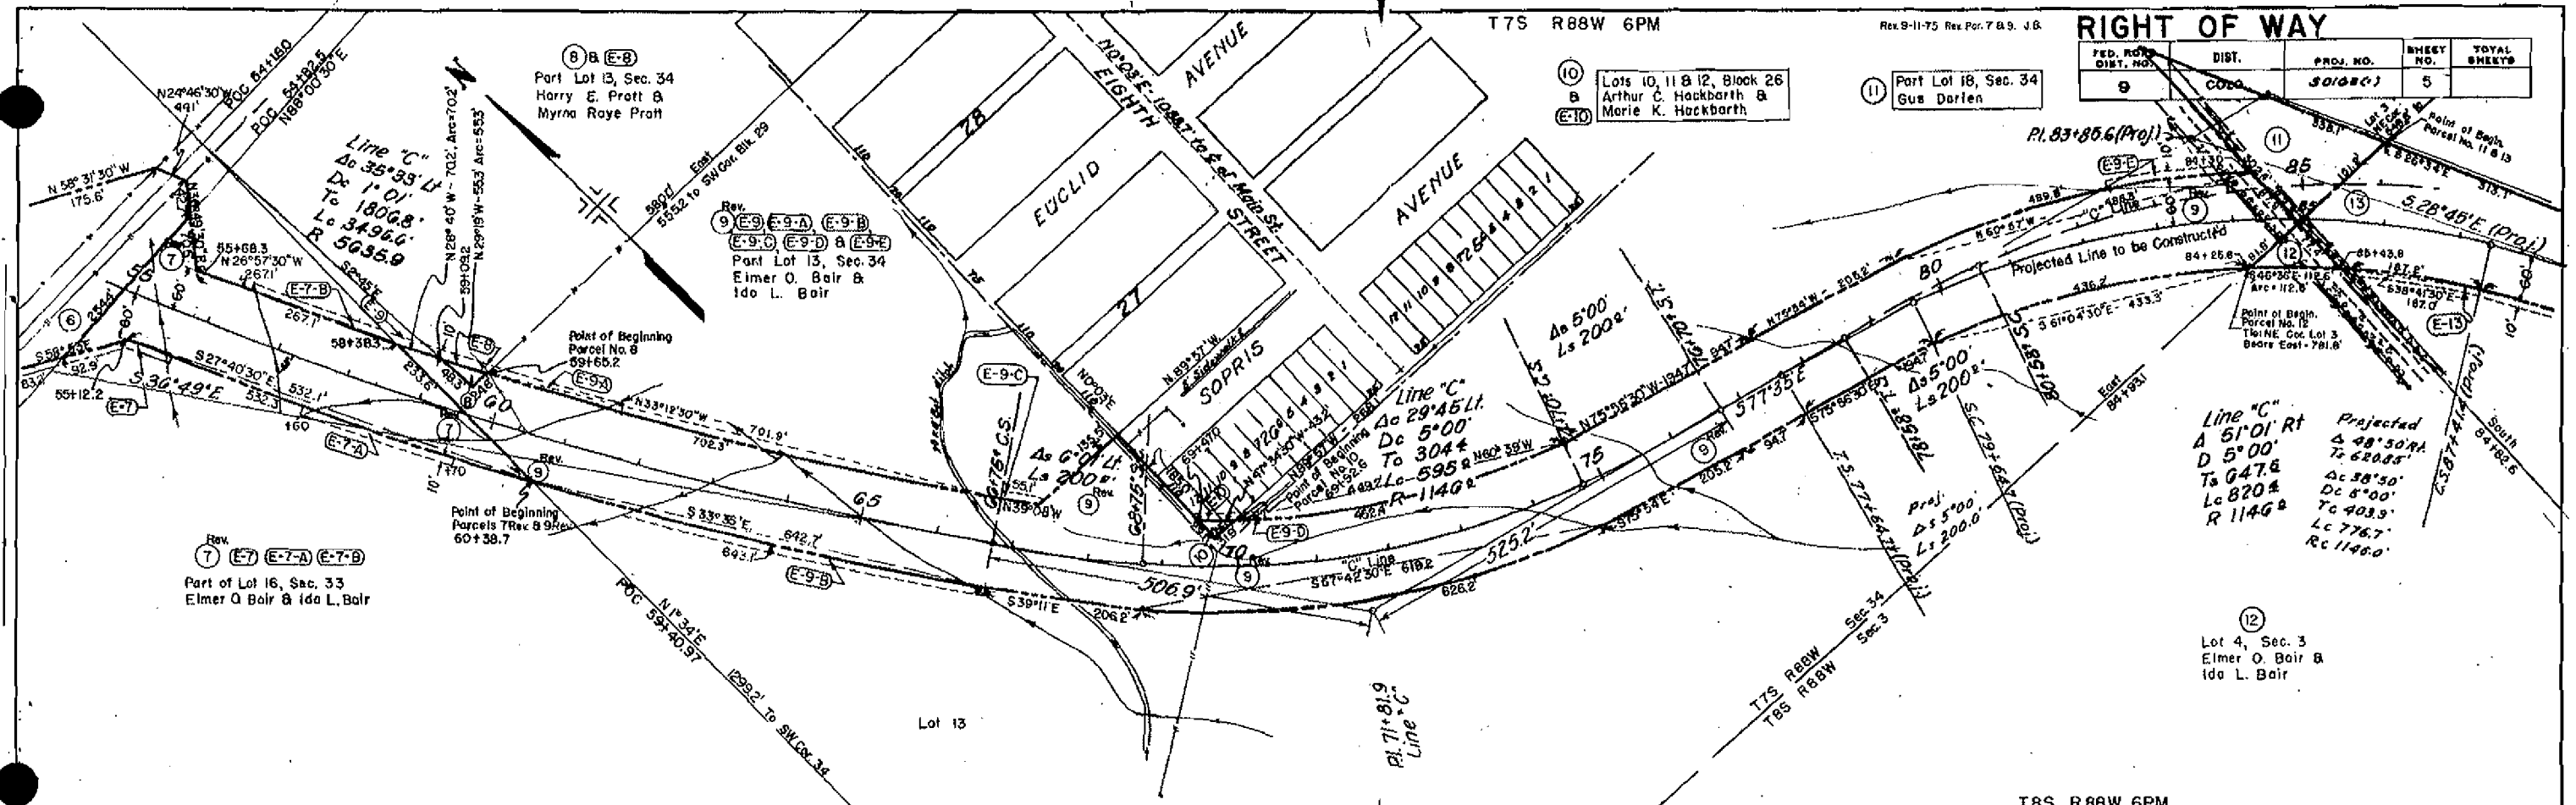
PLAN - PROFILE OF P. R. A. S. ROAD
